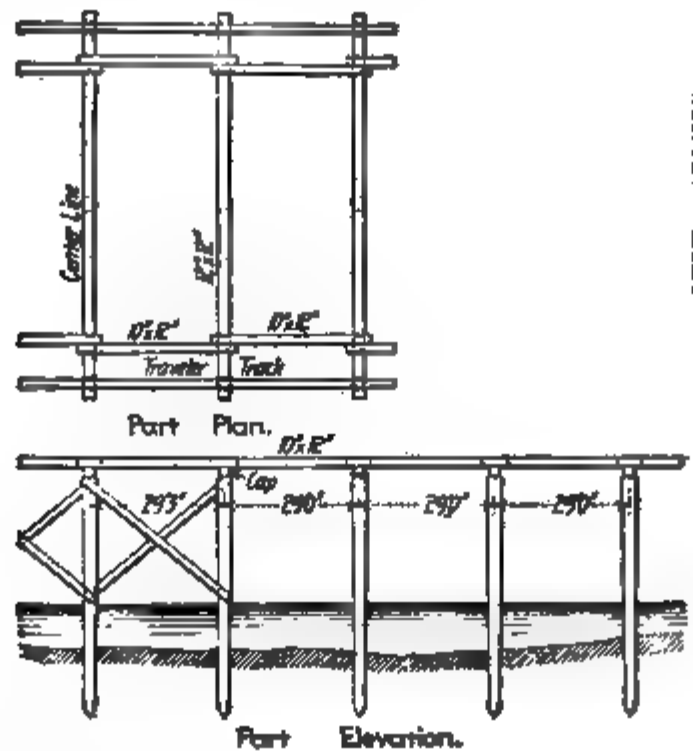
FALSEWORK FOR ERECTING A HIGHWAY BRIDGE.
